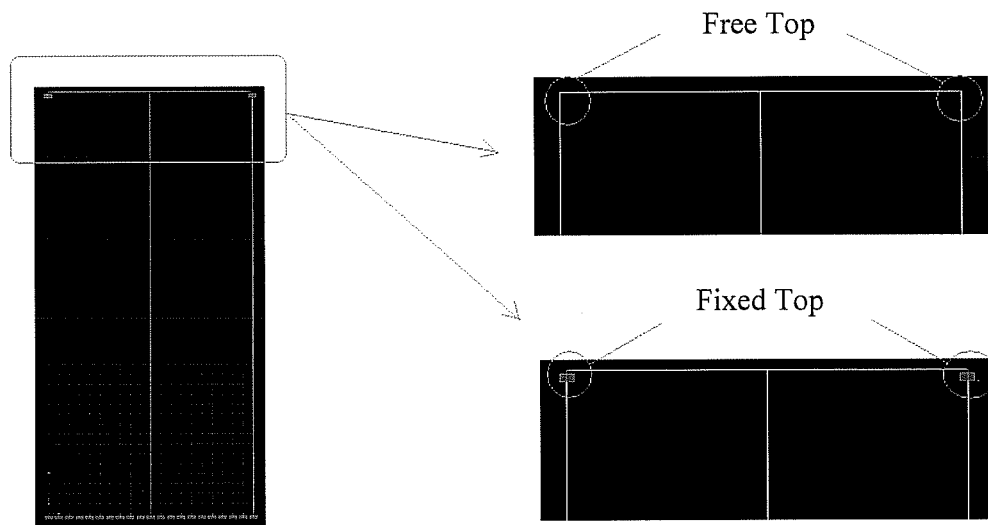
Bridge Pier Top Boundary Condition: (a) Free Top, (b) Fixed Top
